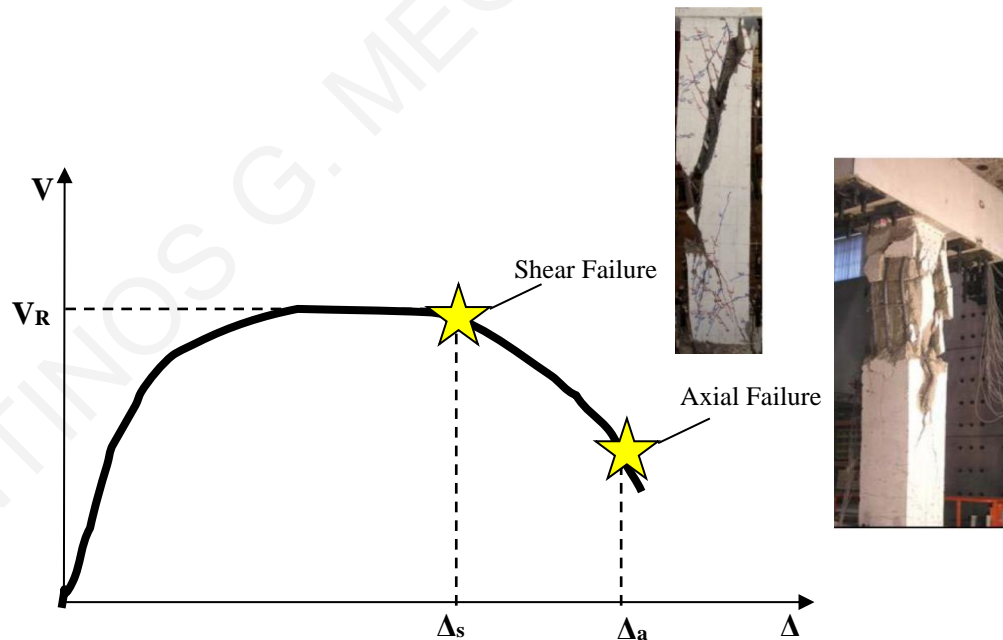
Definition of Deformation Limits at Shear and Axial Failure of a Reinforced Concrete Column.
